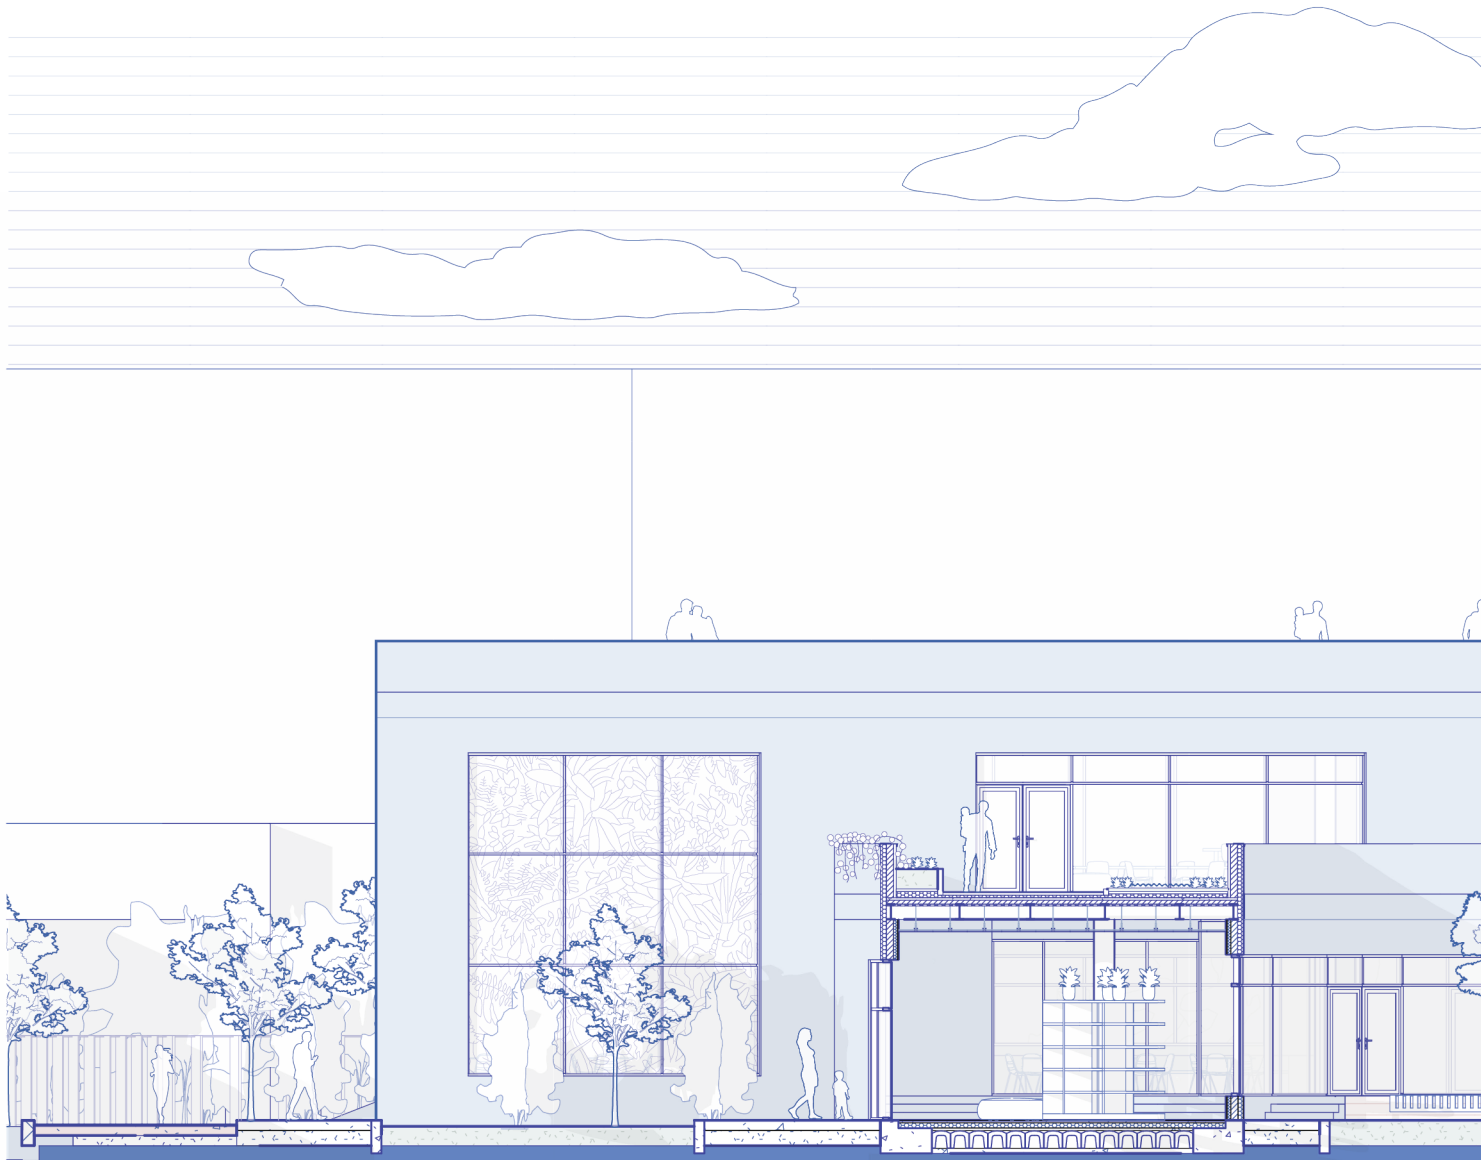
West and South elevation. Scale: 1:150. Made by the author.
